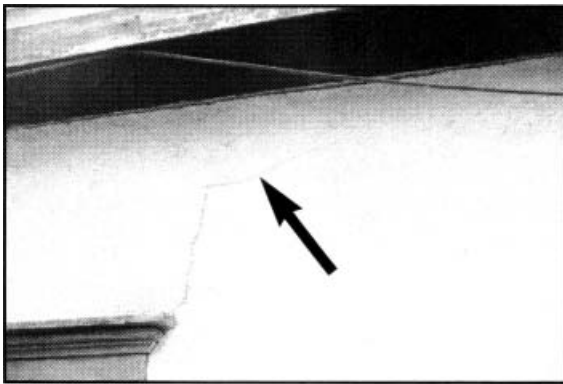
Crack at a window opening, west wall above the area shown in Figure 10.8. The window is just south of the central doorway. The crack tapers in width indicating that the wall has slumped in this area.
